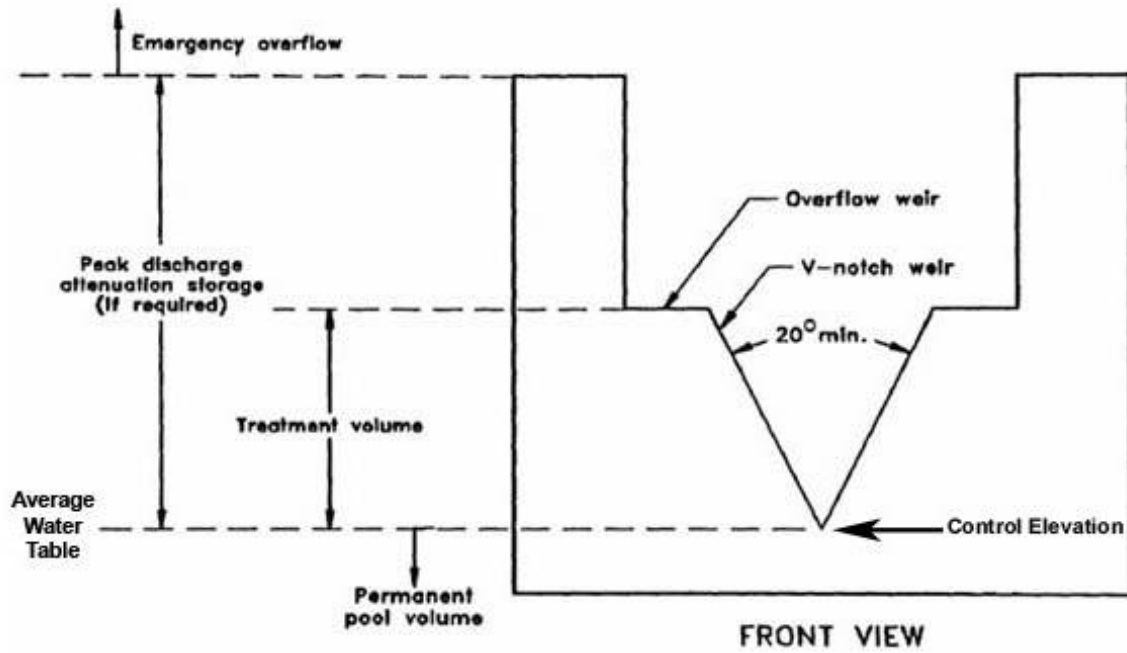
Typical wet detention outfall structure with "V"-notch weir (N.T.S.).
